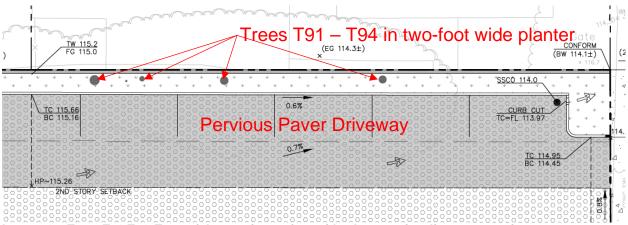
Trees T91-T94, Tree -of -heaven in two-foot-wide planter strip adjacent to pervious paver driveway. Illustration from BkF preliminary grading plan, dated 5/2020.
